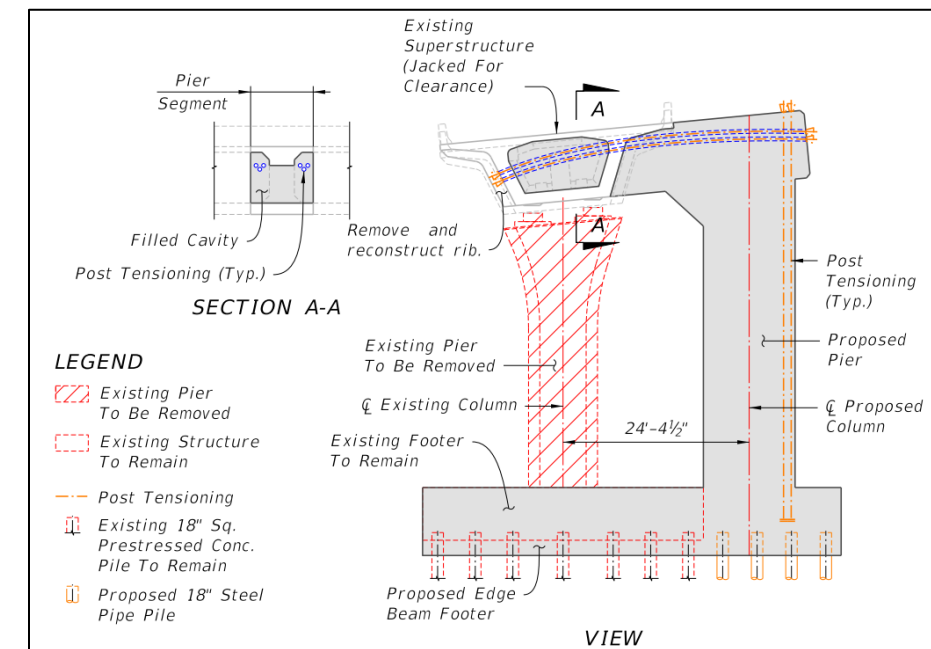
Proposed cantilever pier retrofit at Pier 7-E
